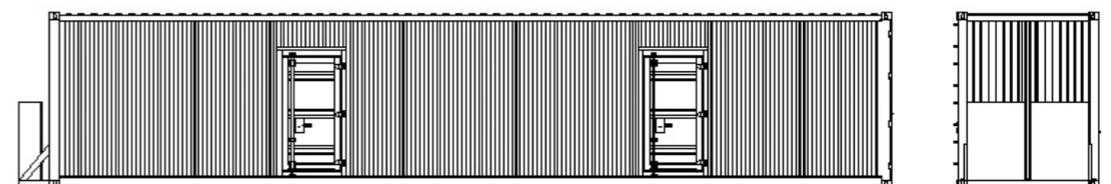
Dimensional Drawing of G31-35kV-Outdoor-Water Cooling FGSVG-C6.0/35-OW
